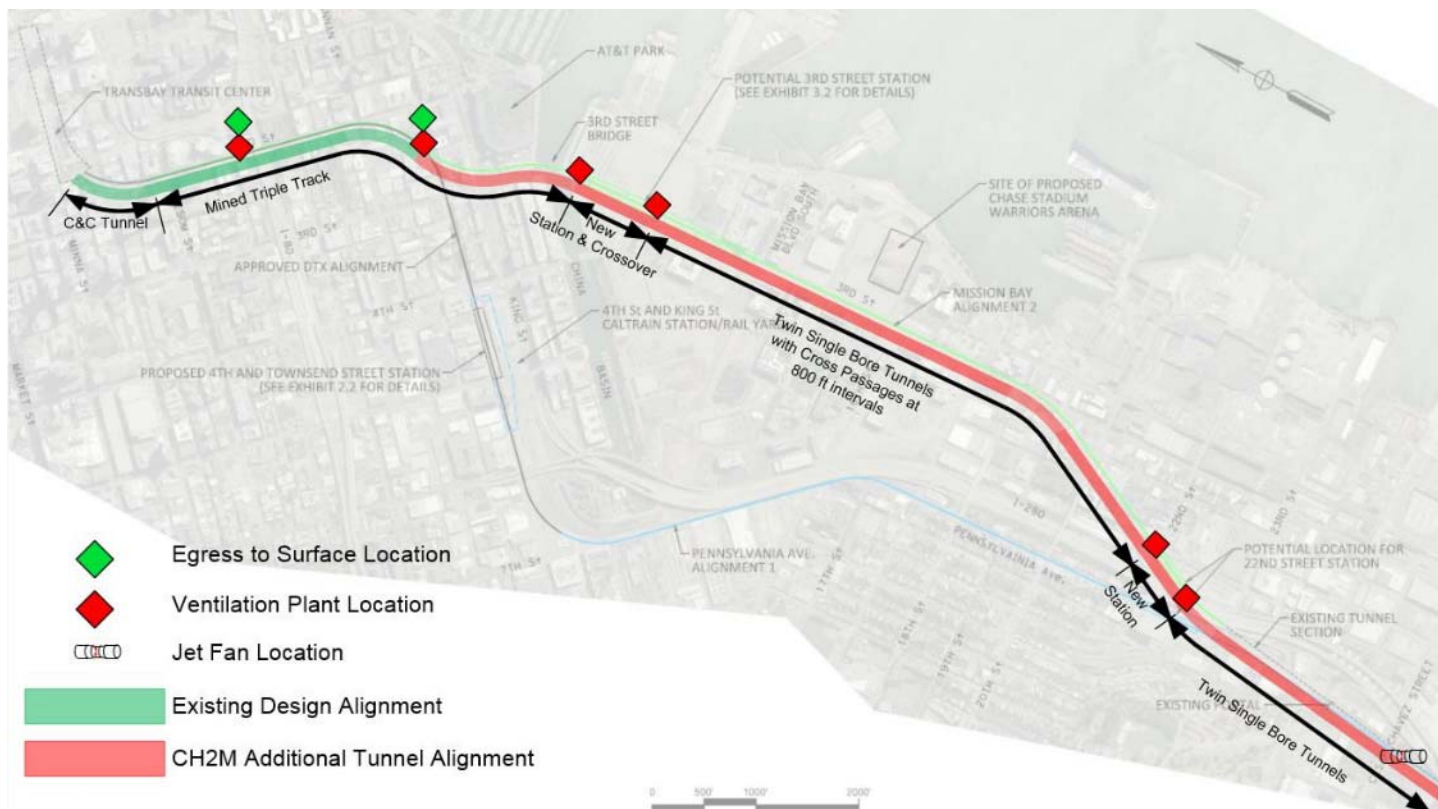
Mission Bay Alignment, Station Alternative 1 Ventilation Plan
